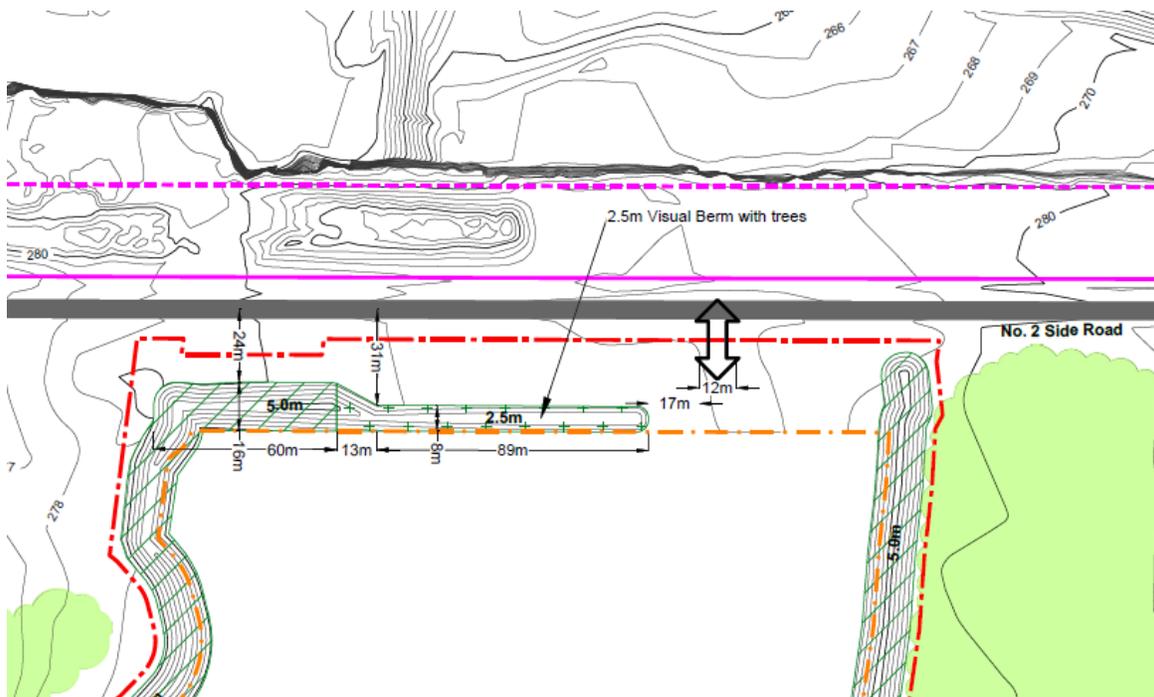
Location of proposed berms and crossing (MHBC)¹³.
